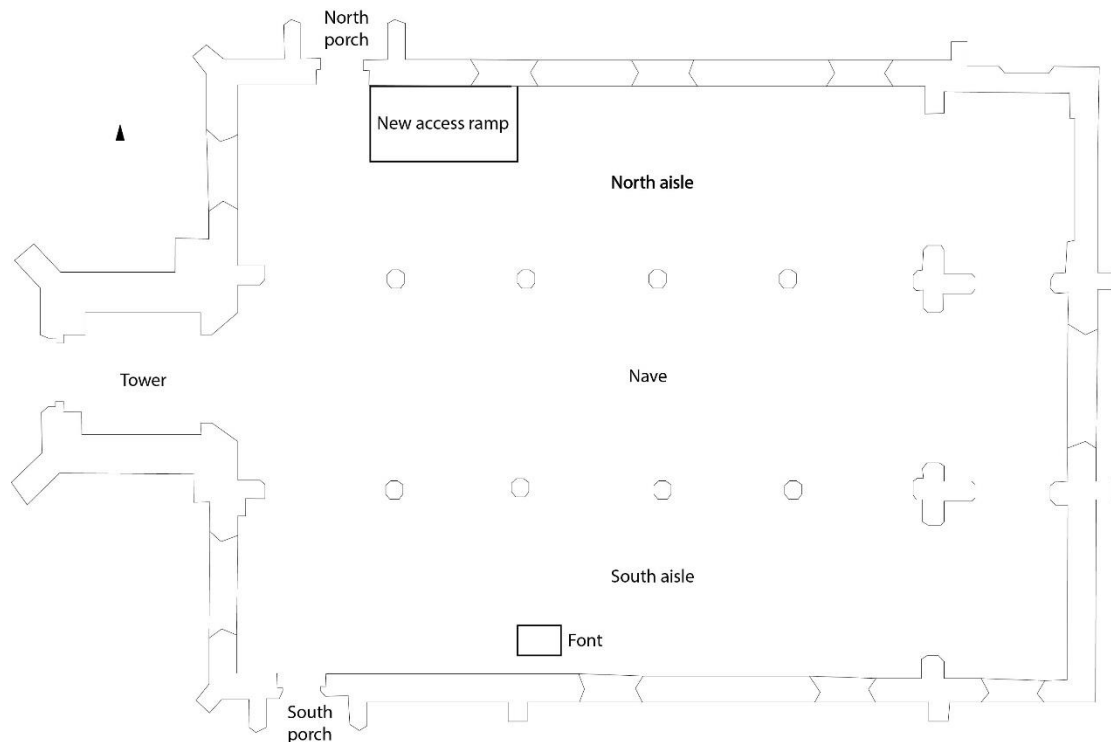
Plan of the church (courtesy Graham Holland Associates, not to scale)
